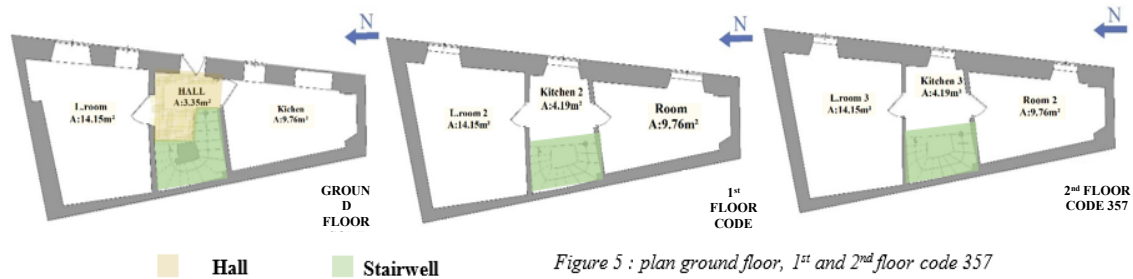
plan ground floor, 1st and 2nd floor code 357
